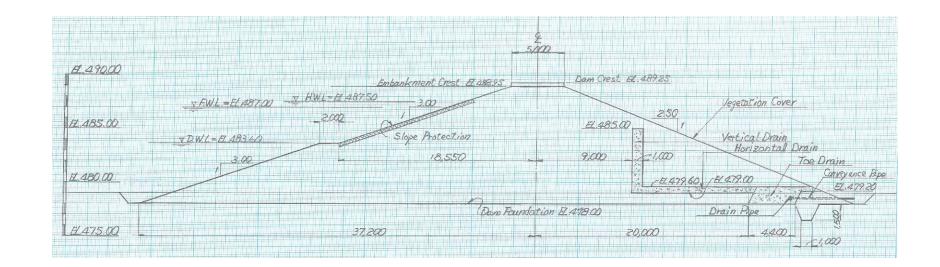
Typical cross-section of Jebel Lado Dam
